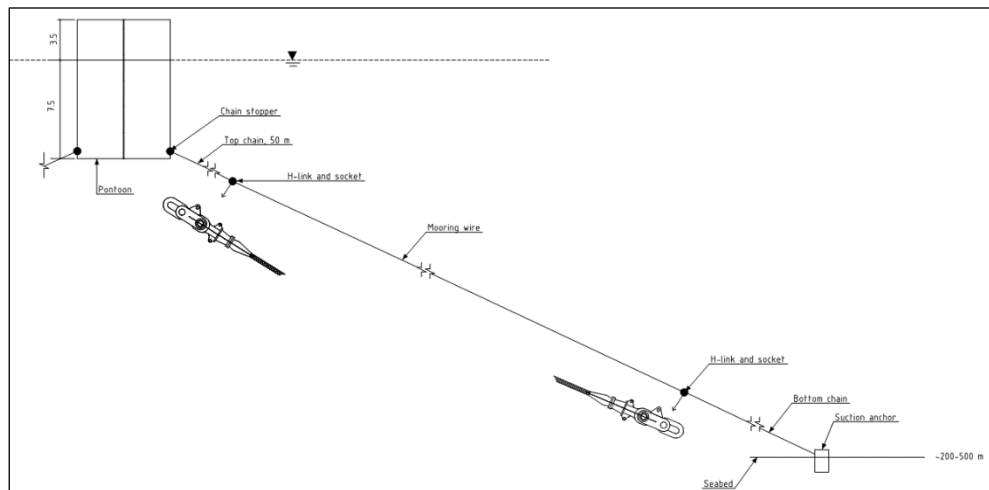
Concept of mooring system (ref. /7/ appendix A, drawing 701)
